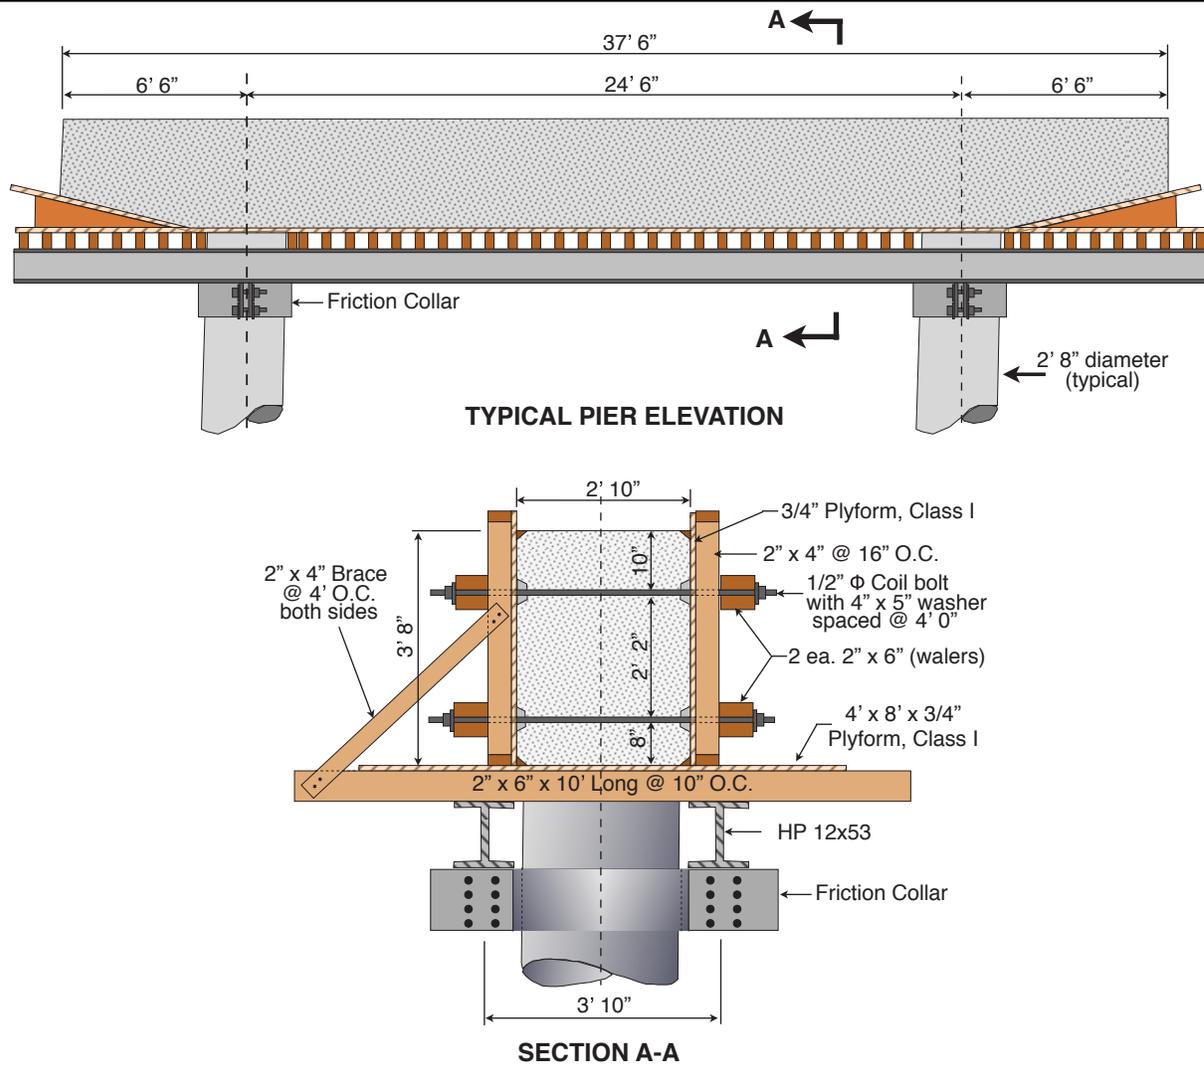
Details of typical form and falsework used for the construction of concrete pier caps.
